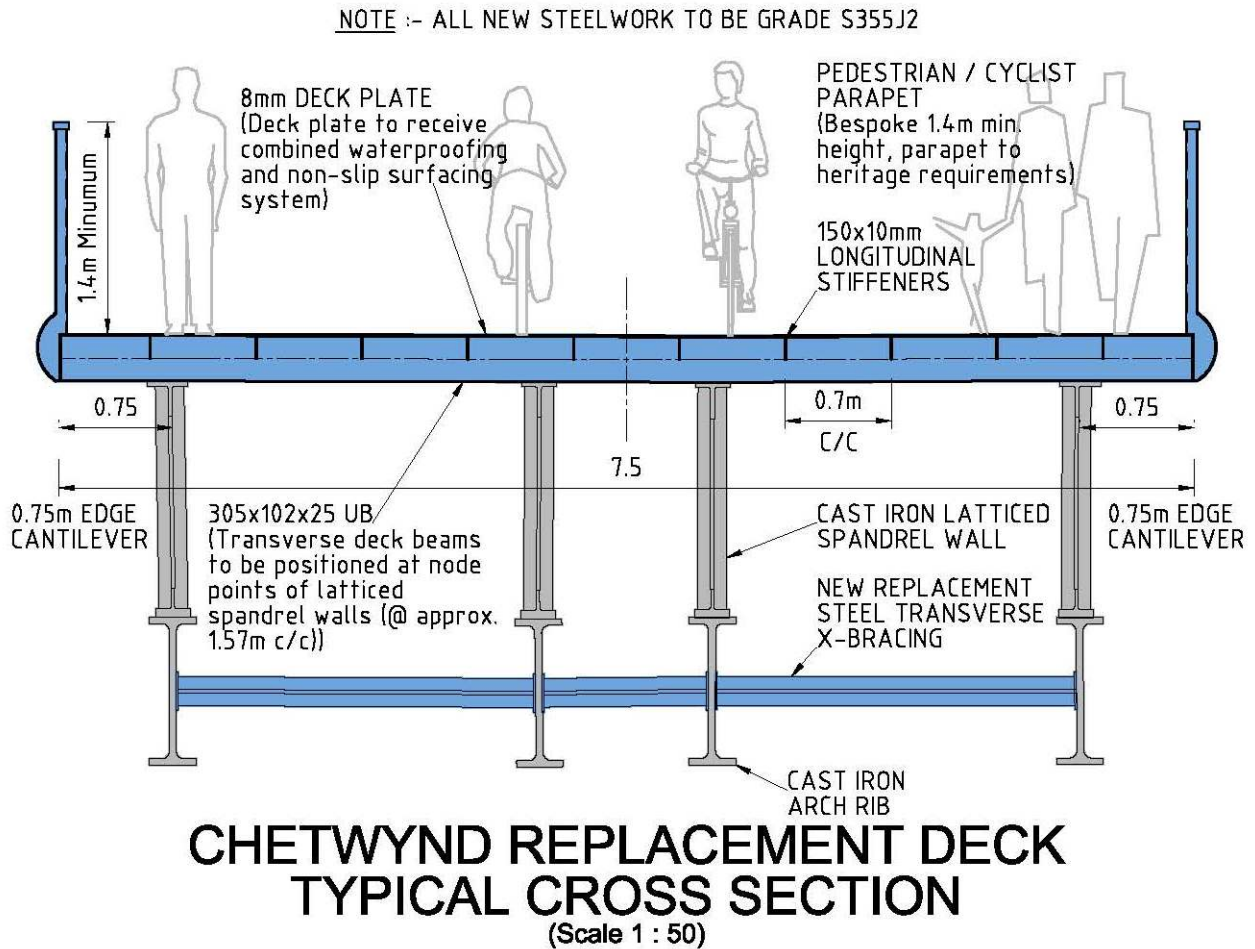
Preliminary structural form of deck replacement (existing cast iron shown in grey, new steelwork shown in blue)
